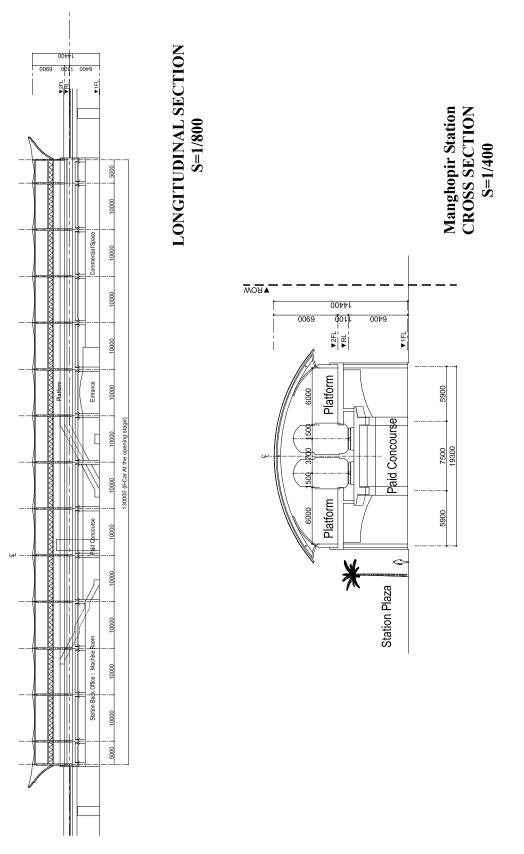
Station Architect Conceptual Plan (Manghopir Station)
